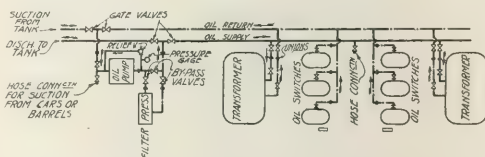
LAYOUT OF PIPING FOR OIL SUPPLY AND RETURN
